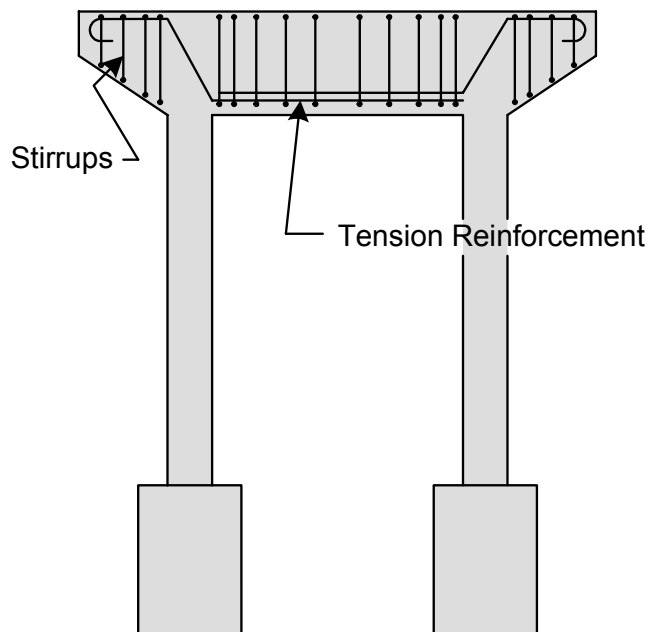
Spandrel Bent Cap Reinforcement
